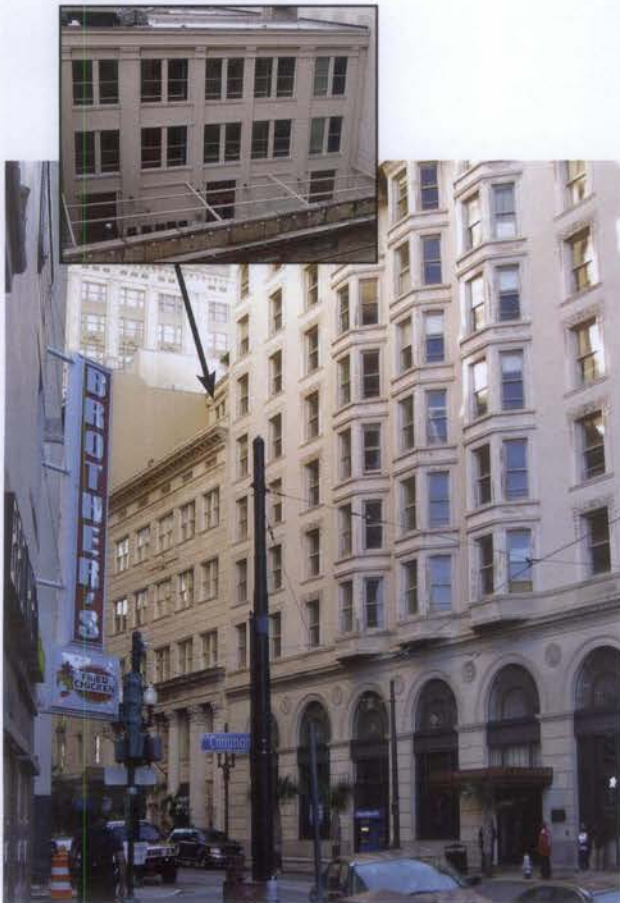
It was possible to add a compatible, three-story, penthouse addition to the roof of this five-story, historic bank building because the addition is set far back, it is surrounded by taller buildings and a deep parapet conceals almost all of the addition from below.
